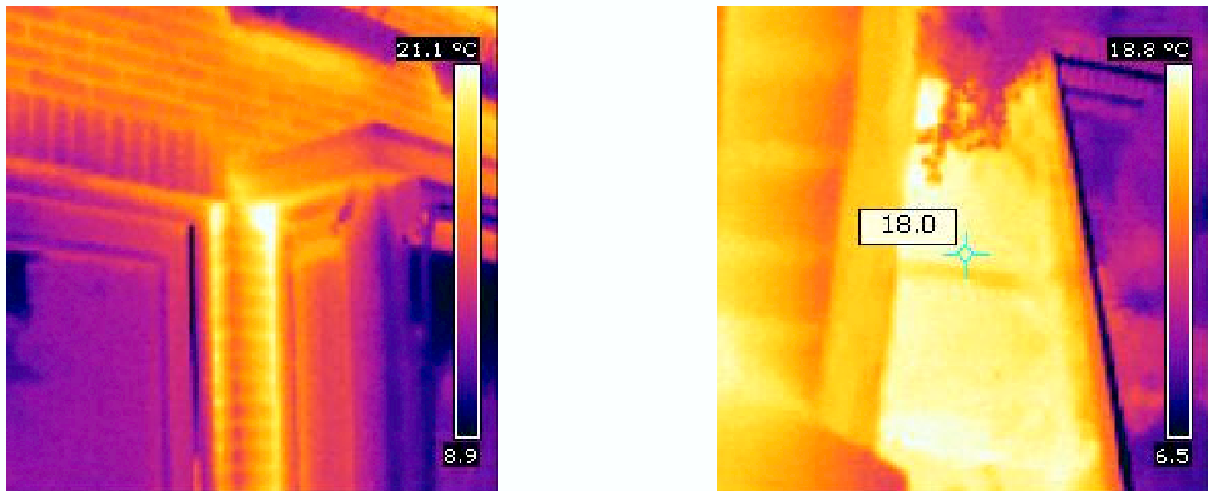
Pictures demonstrating the lower heat resistance of the side and roof of a bay.
